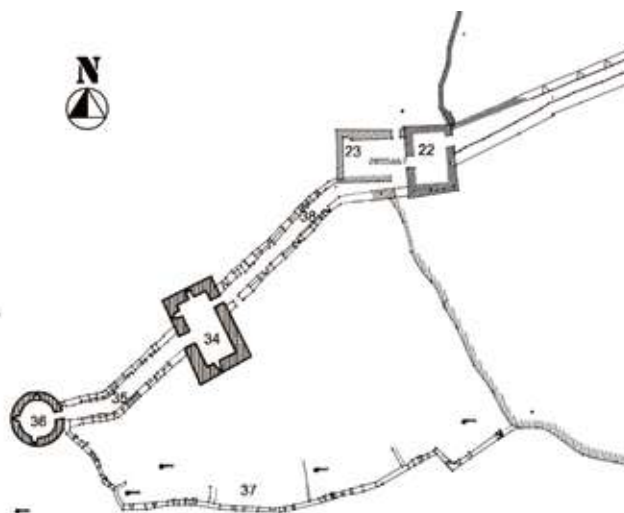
Blown up Layout plan of the Chubjakha Dzong ruin
